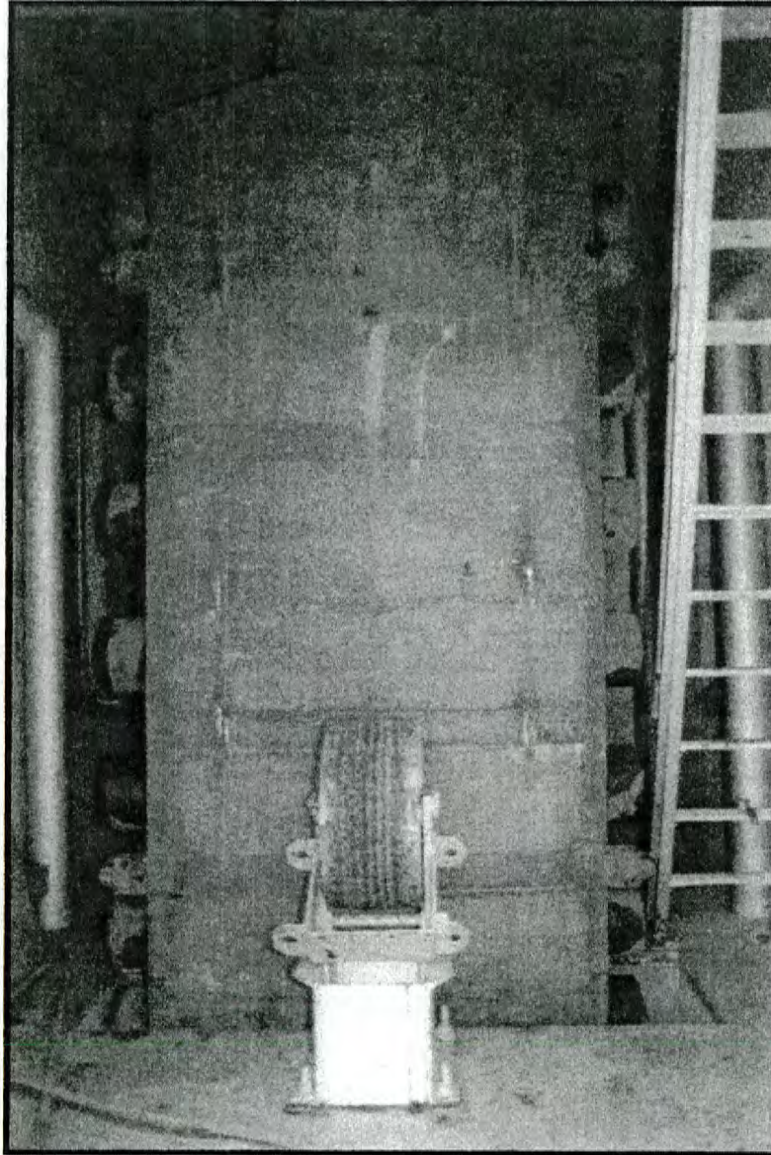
Interior view of the Thorpe Dam diversion gatehouse showing raised steel gate.
